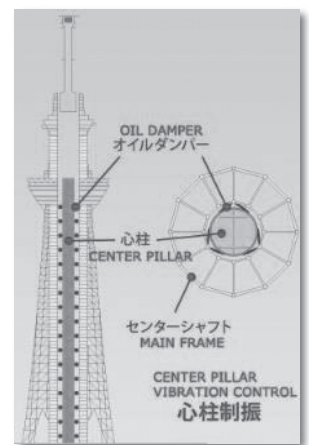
The central pillar concept inside the Tokyo Skytree [18]
